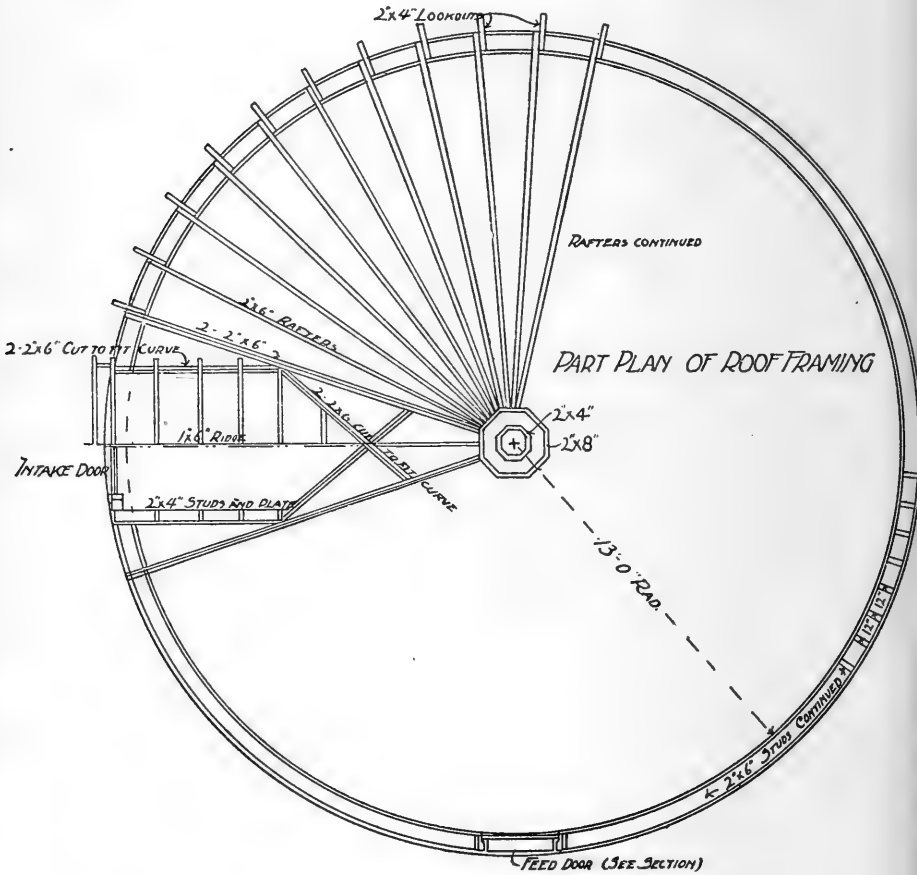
FRAMING PLAN OF ROUND WOODEN SILO.
